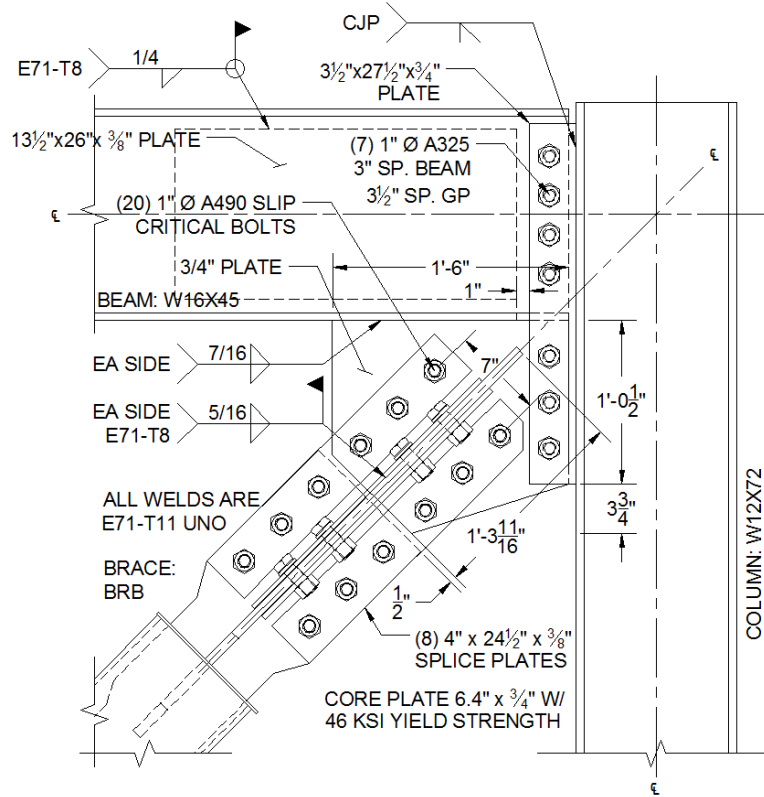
Connection Detail for Specimen NCBF2-R1
